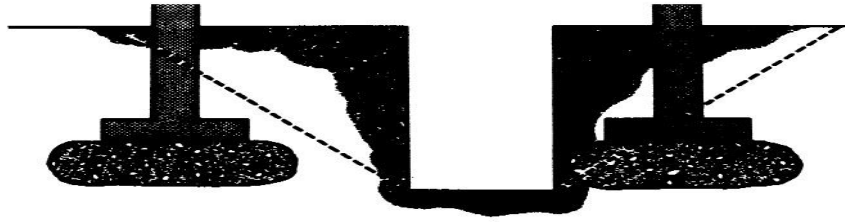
The failure zones reaching the foundations of the adjacent buildings near to the excavation
